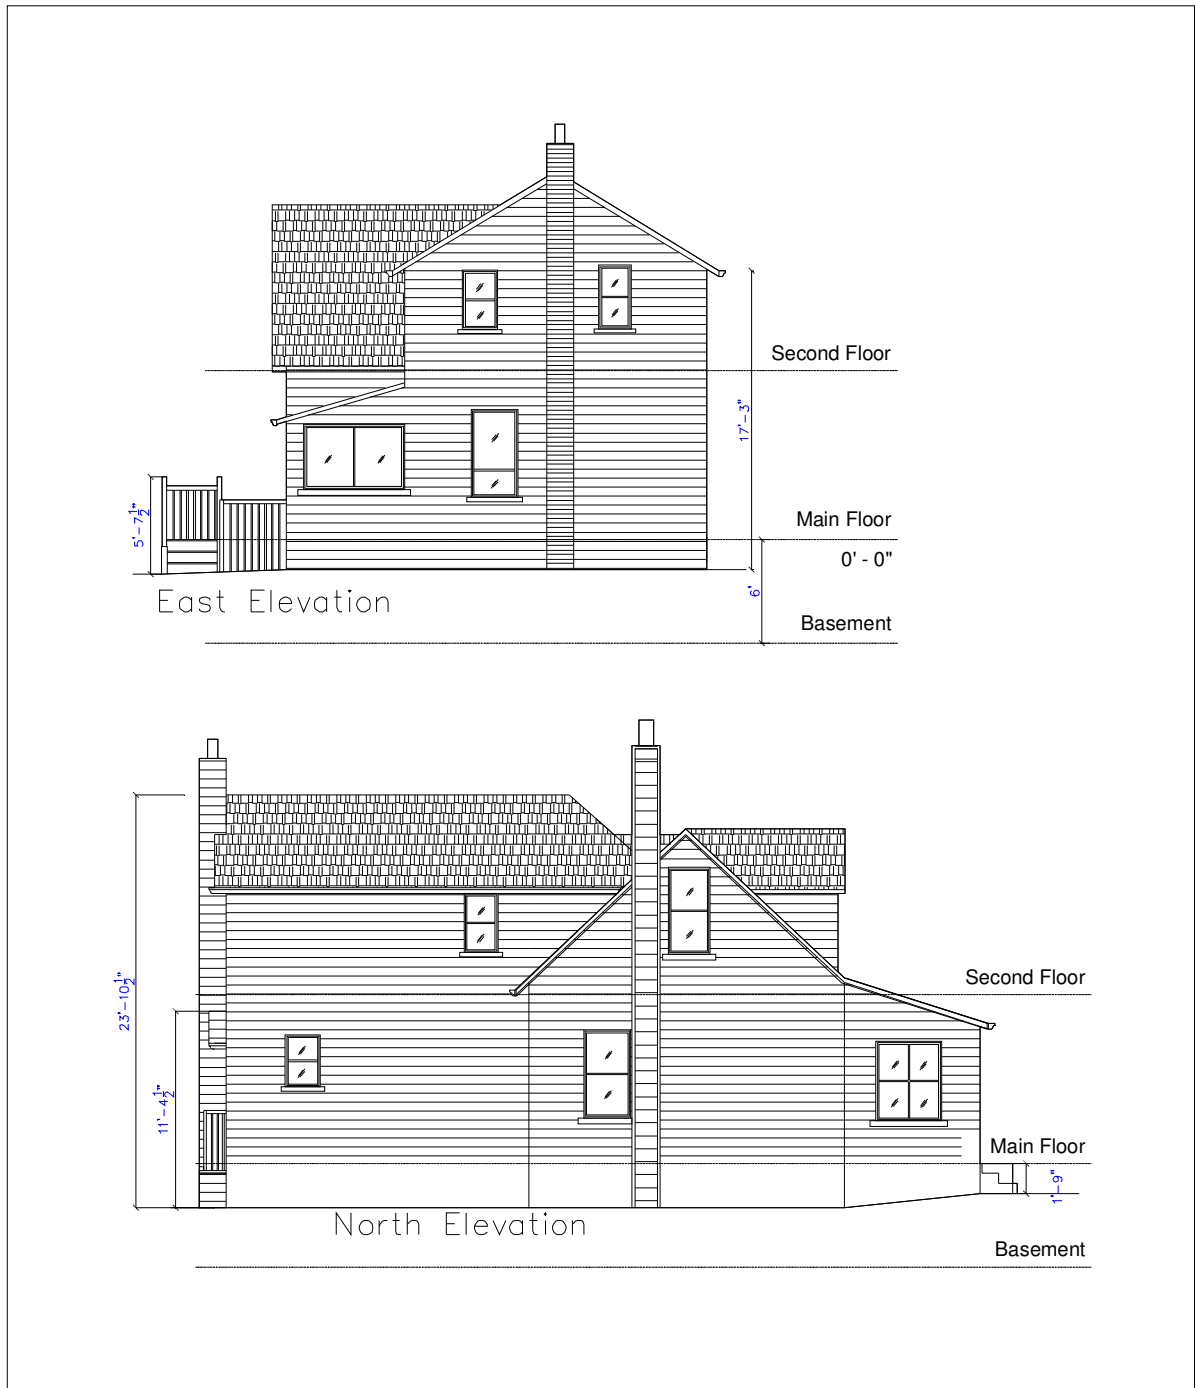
Interior lot line elevations of the existing house. East (rear), above. North side, below.
